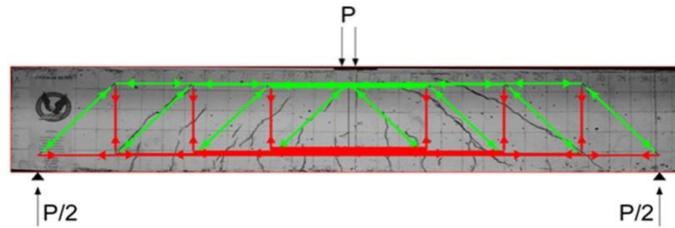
Mörsch Truss Analogy for cracked concrete beam.
